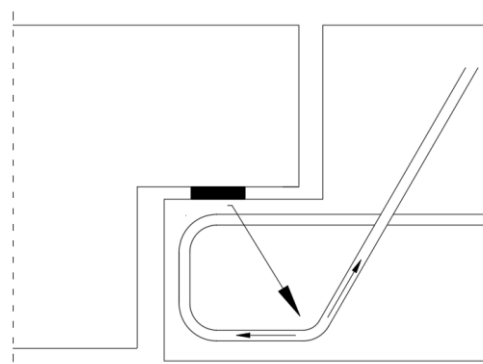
Equilibrium of connection provided by use of longitudinal reinforcement.
